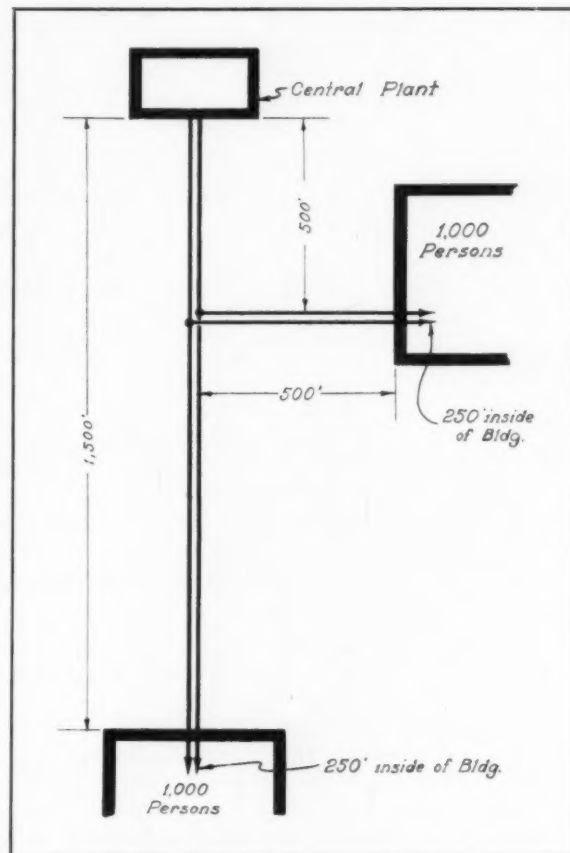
In Providing Cooled Drinking Water from a Central Plant to the Other Buildings, Length of Run Is an Important Factor
